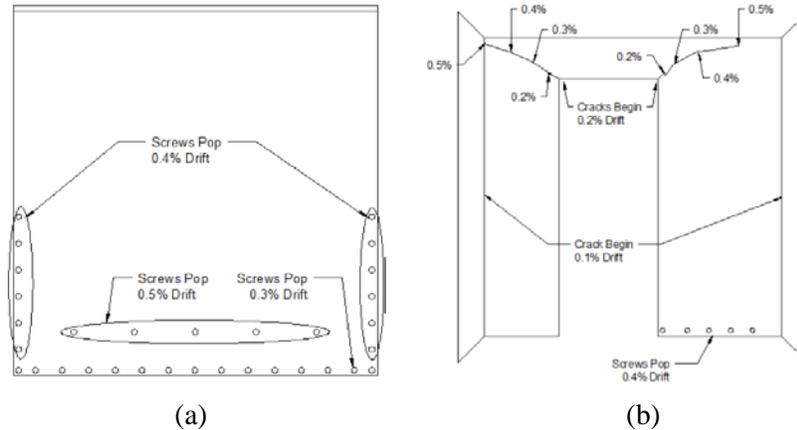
Damage Progression Unibody Walls: (a) GYP – GYP, (b) GYP – GYP (wall returns, door opening) [11]
